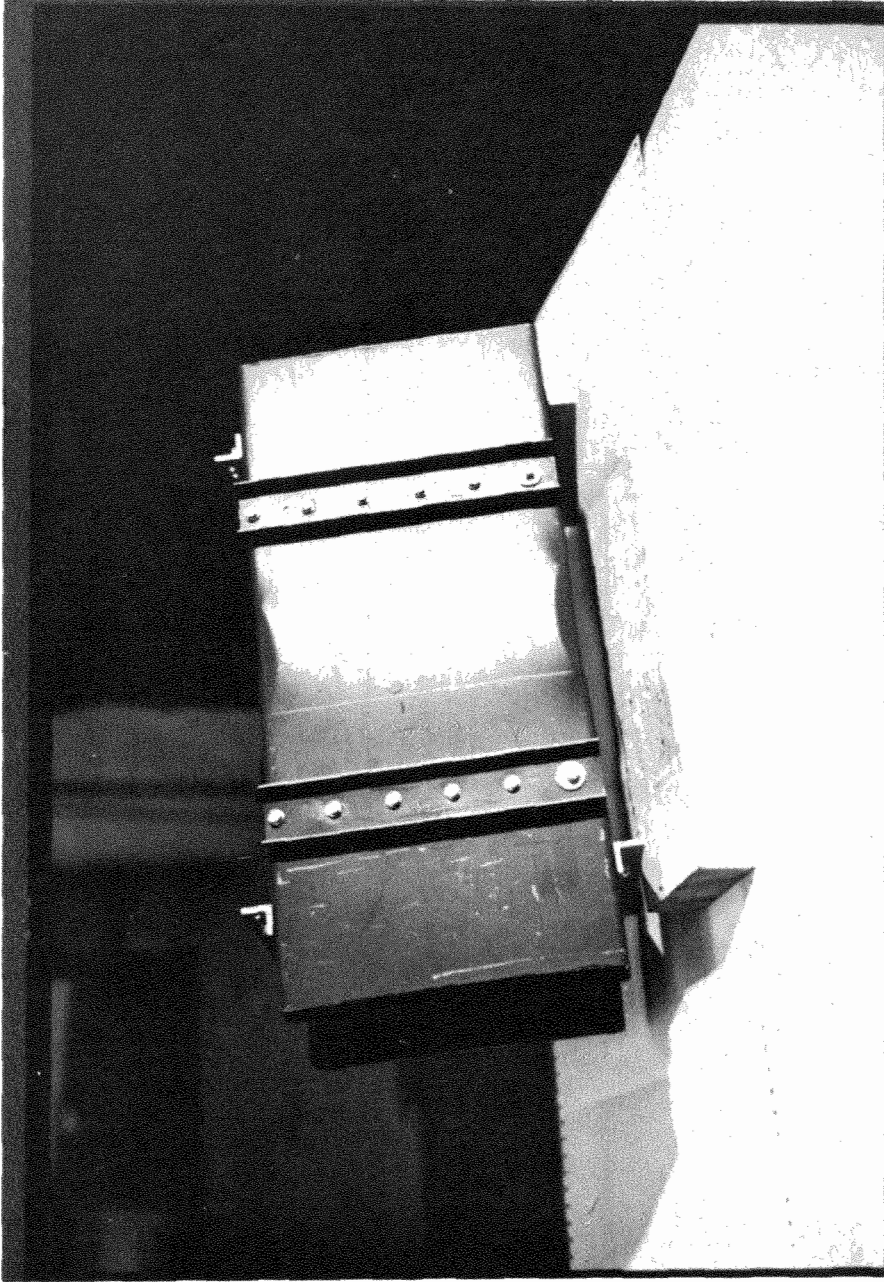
Typical Failure Pattern for Two-Flange Web Crippling Test Specimen
